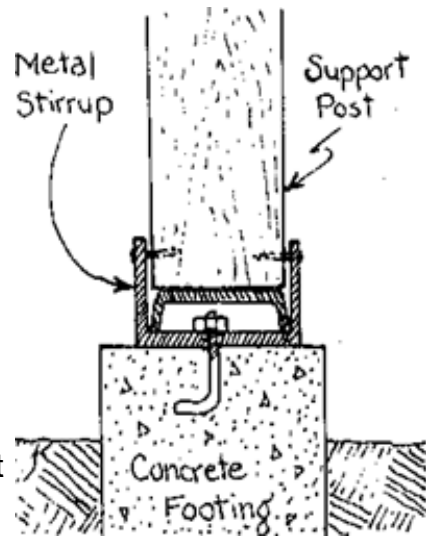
A porch's concrete footings (The Old House Journal, 1981, p.222).
